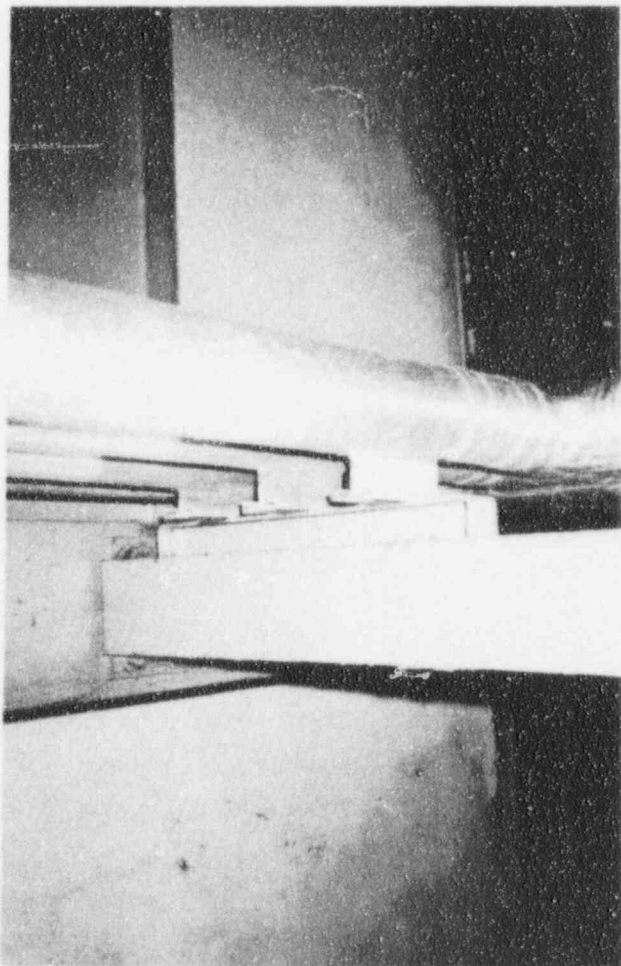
Guide Supports for Large Bore Hot Line in Glendale Unit 4
